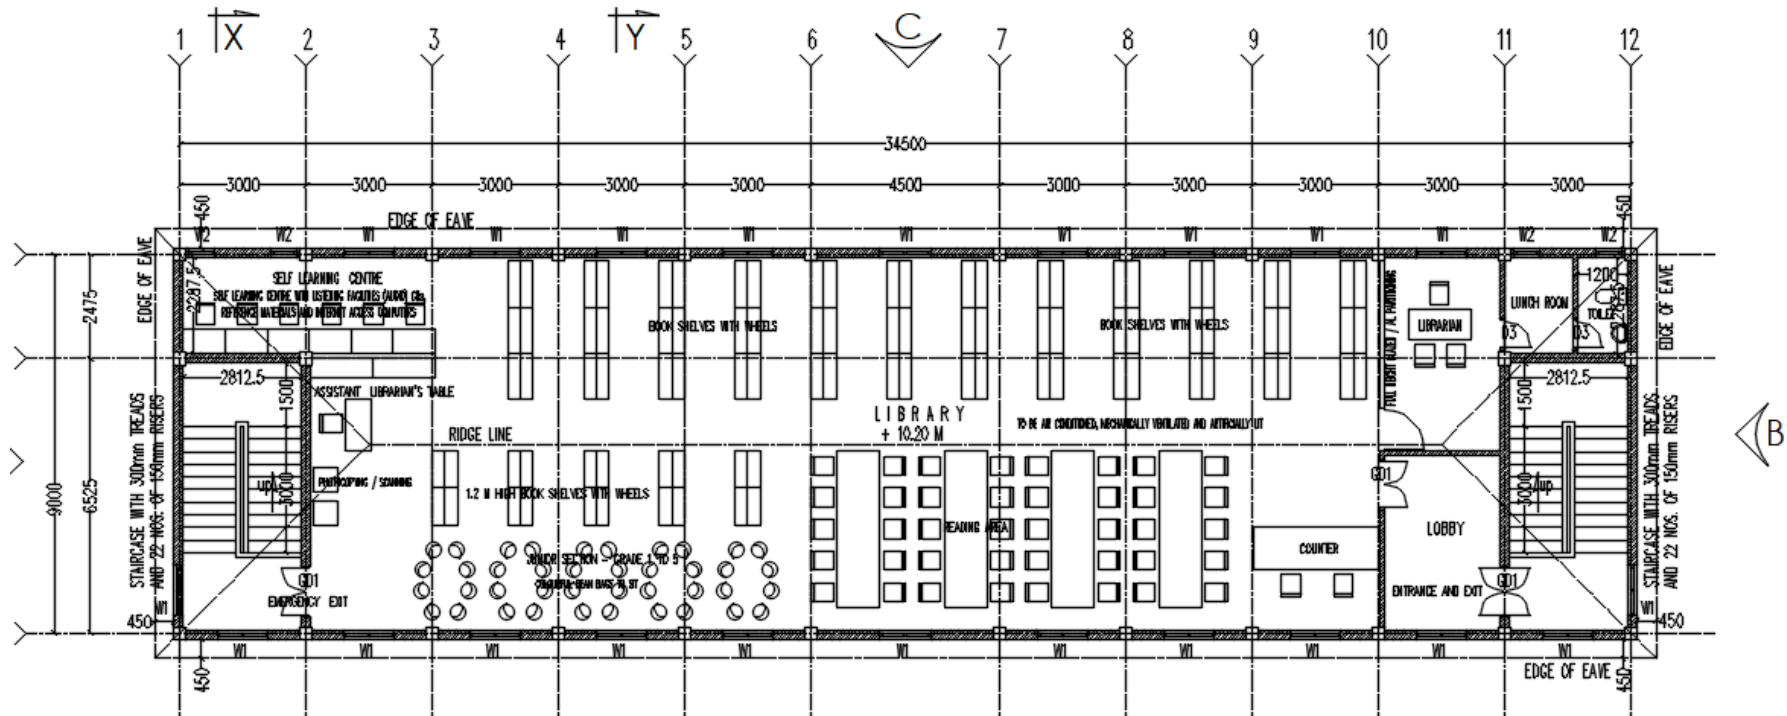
Thid floor plan – Mahanama college, Colombo 03.
